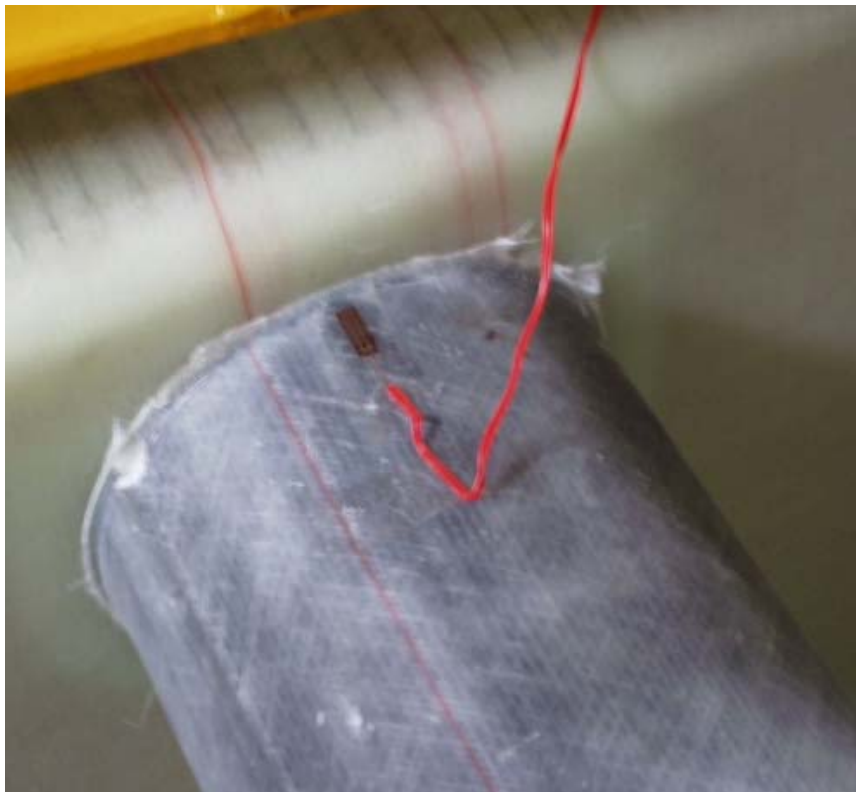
(b) Strain Gauge One Placement on Upper Side of Cross Member
